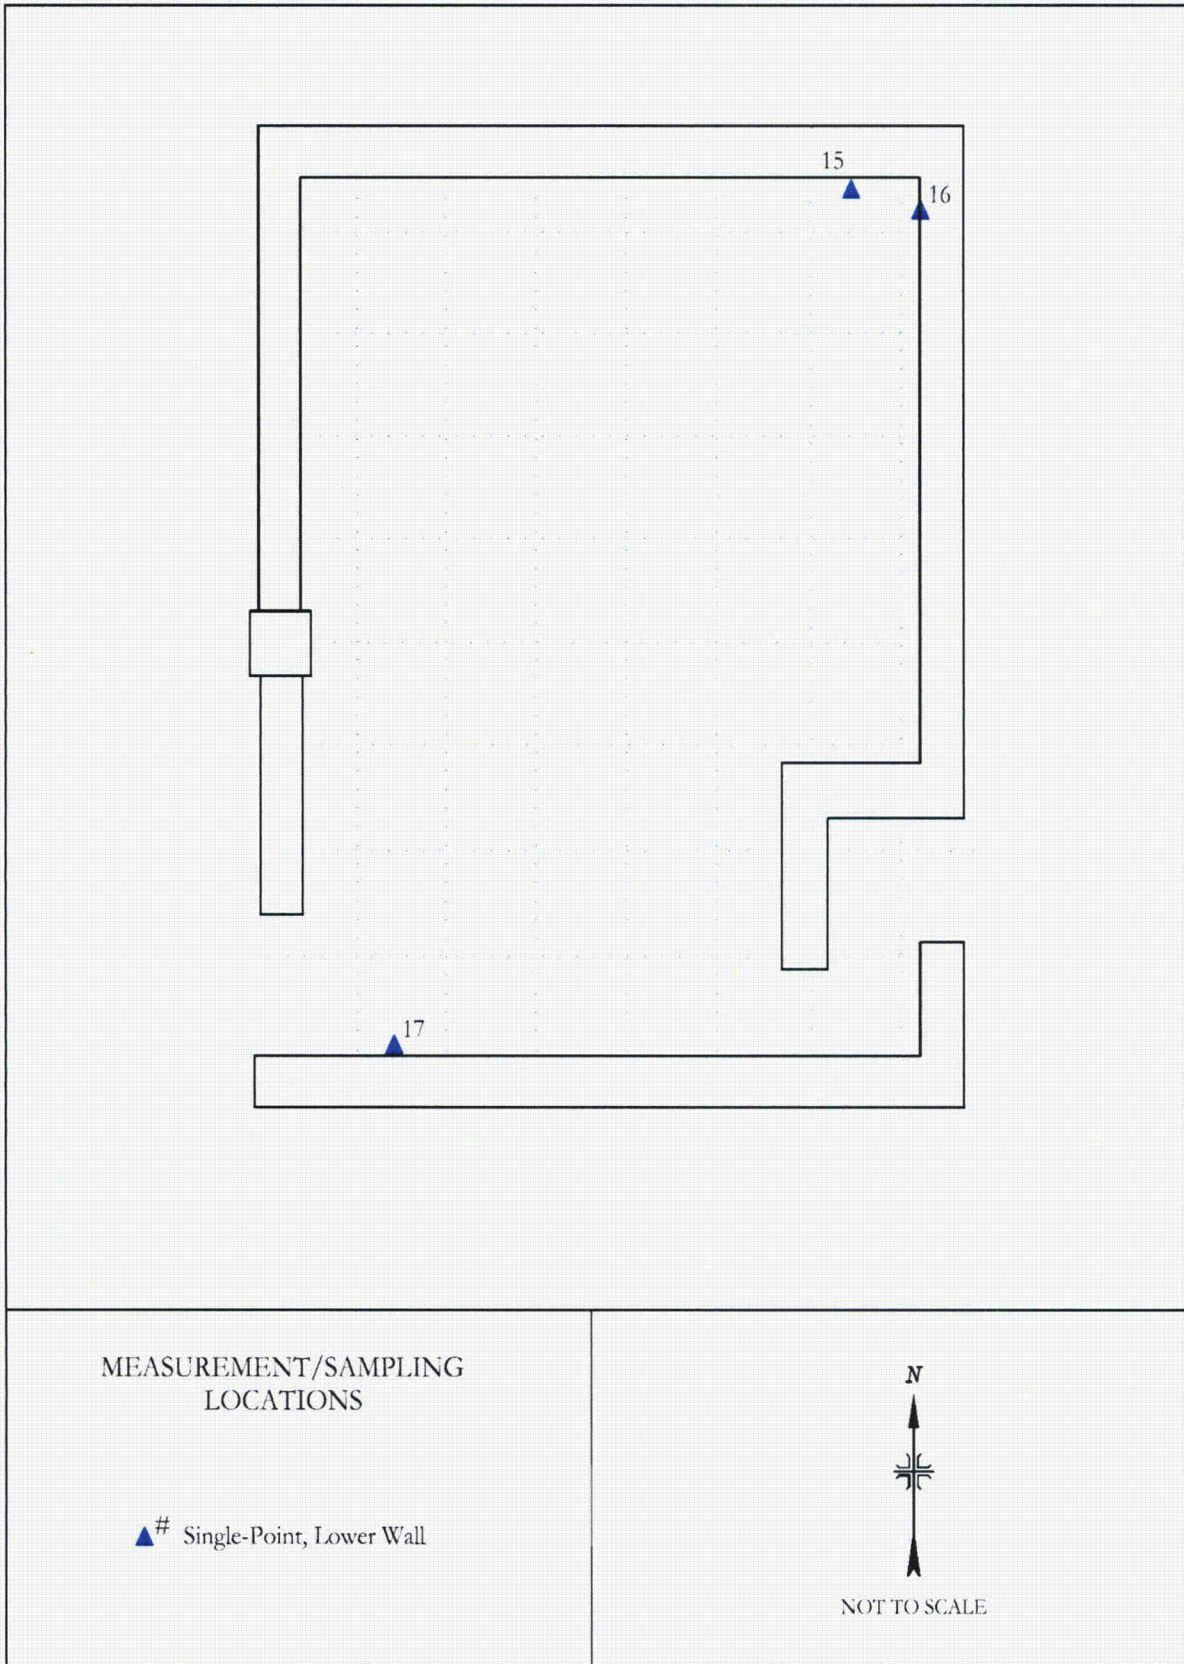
Auxiliary Building, Room 43 - Direct Measurement Locations
